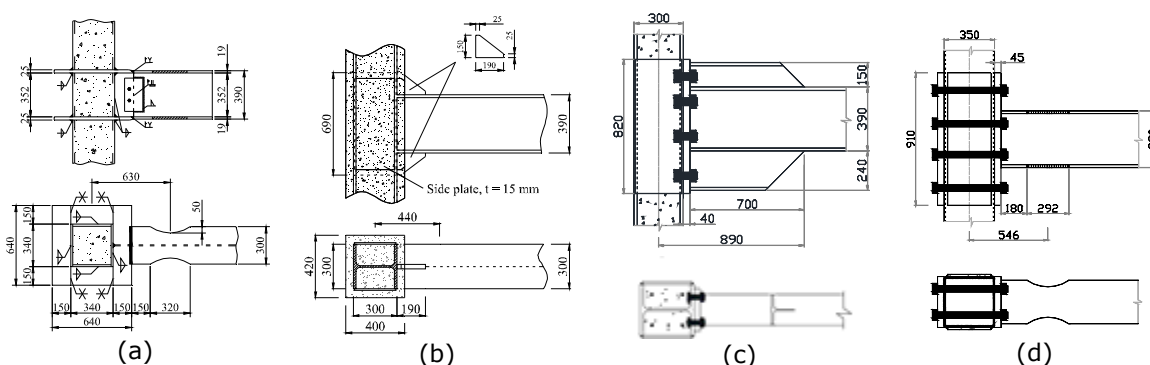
Designed beam-to-column joints: (a) ED-RBS – welded external diaphragm reduced beam section joint; (b) RS – welded rib stiffened joint; (c) HH – bolted hammer head joint; (d) LB-RBS – bolted reduced beam section joint with long bolts
